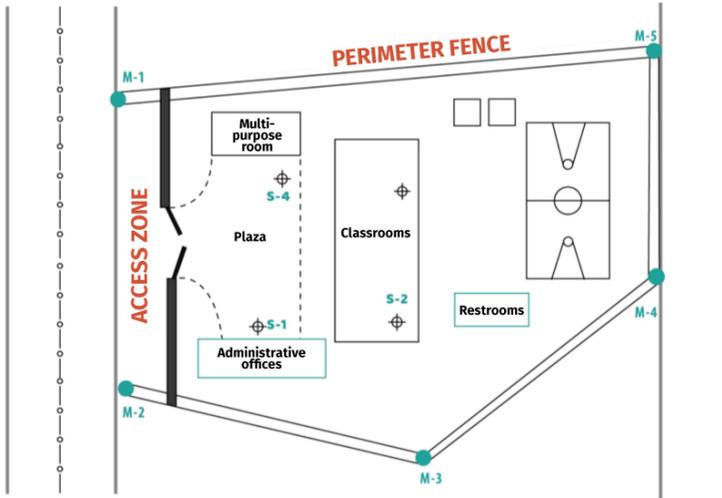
Project construction layout showing the ground investigation required (UNDRR/CAF)
